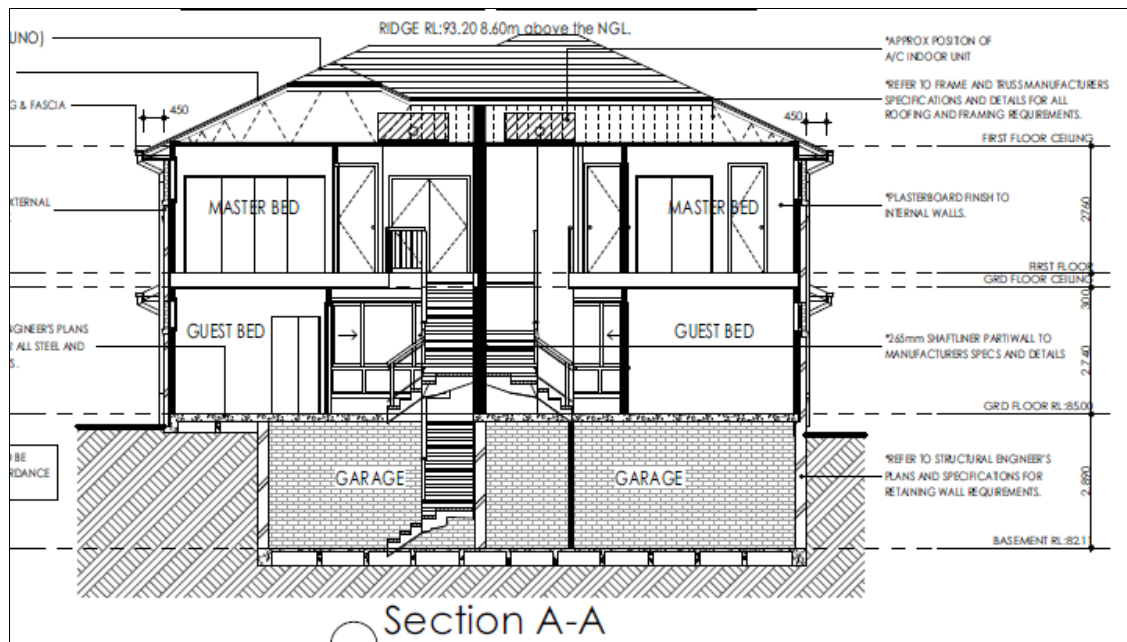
Section A-A Sheet 14 of 17 Issue B5 prepared by SETT Homes
